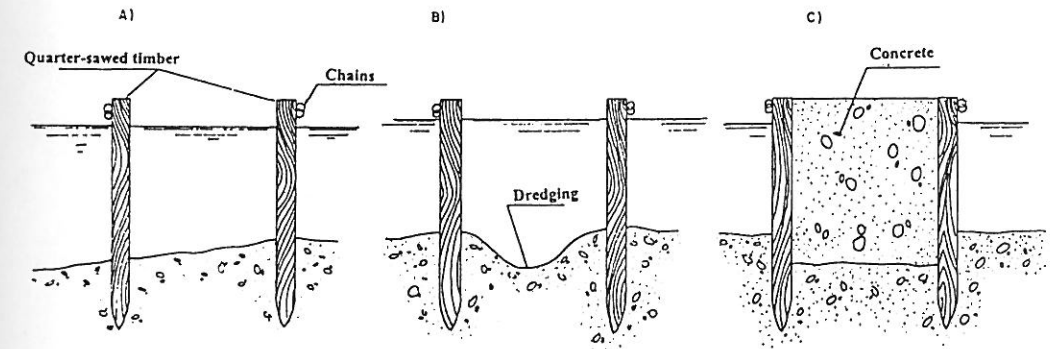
Construction steps for masive concrete vertical breakwater (de la Peña, Prada & Redondo '95, according to Vitruvio (5-13))
